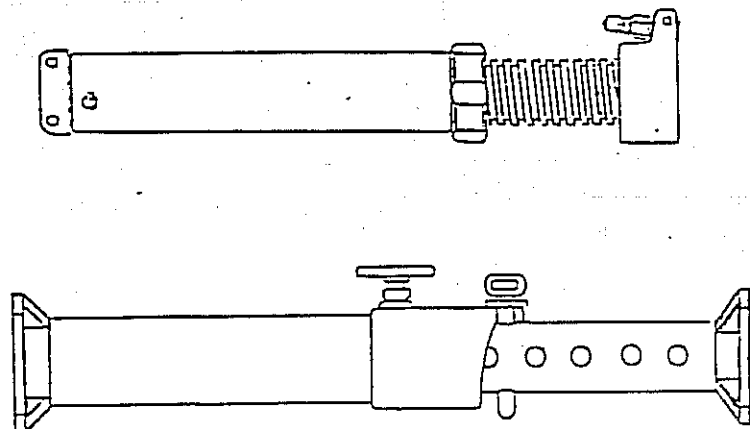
PNEUMATIC/HYDRAULIC SHORING
